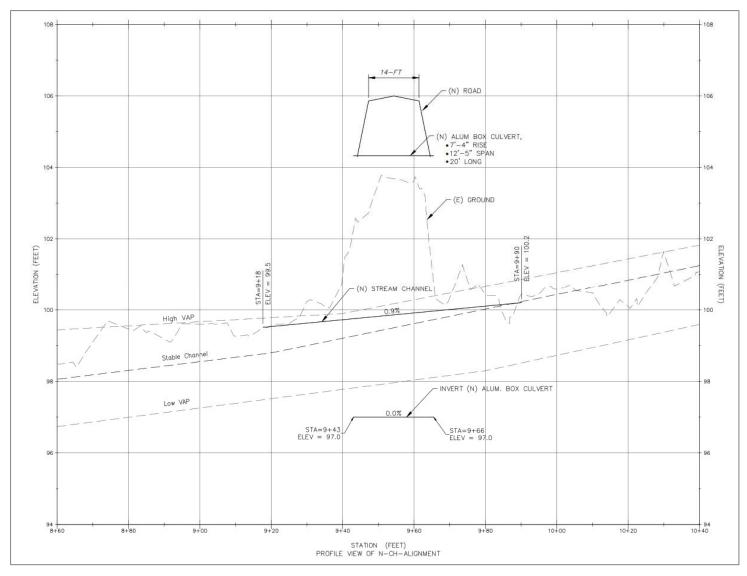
Longitudinal profile of new channel and crossing design, showing the predicted low and high VAP profiles based on existing features upstream and downstream the crossing, and the overall stable channel profile representing future conditions.
